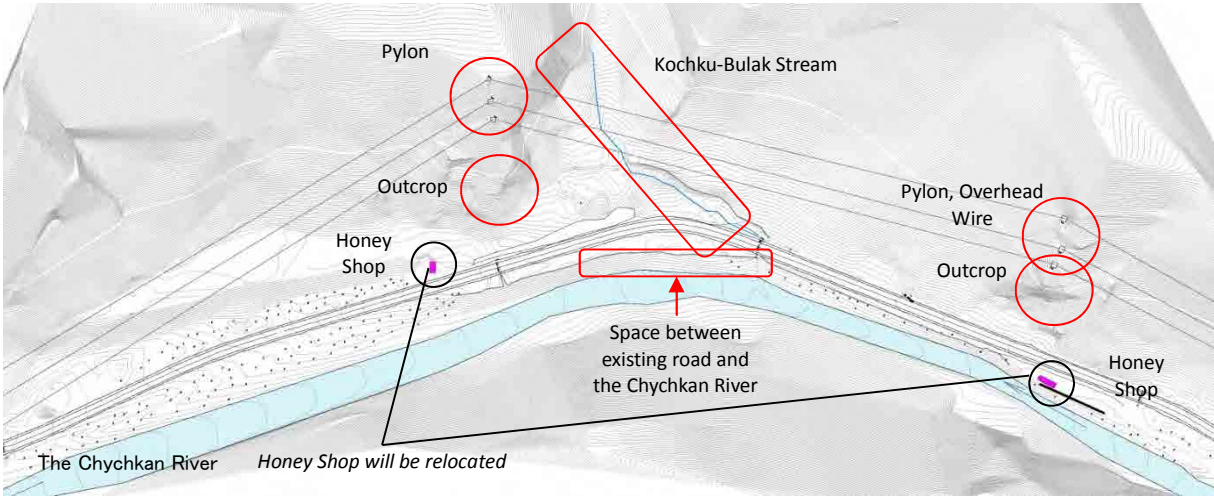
Control Points of Road Alignment in the Project Area
